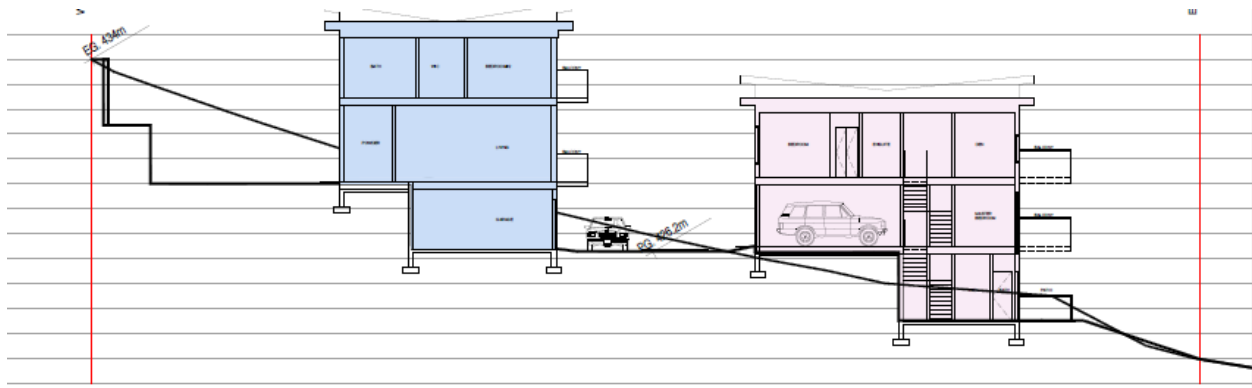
Cross section through south end of site showing integration of townhome product into natural site topography and centrally located laneway access.
